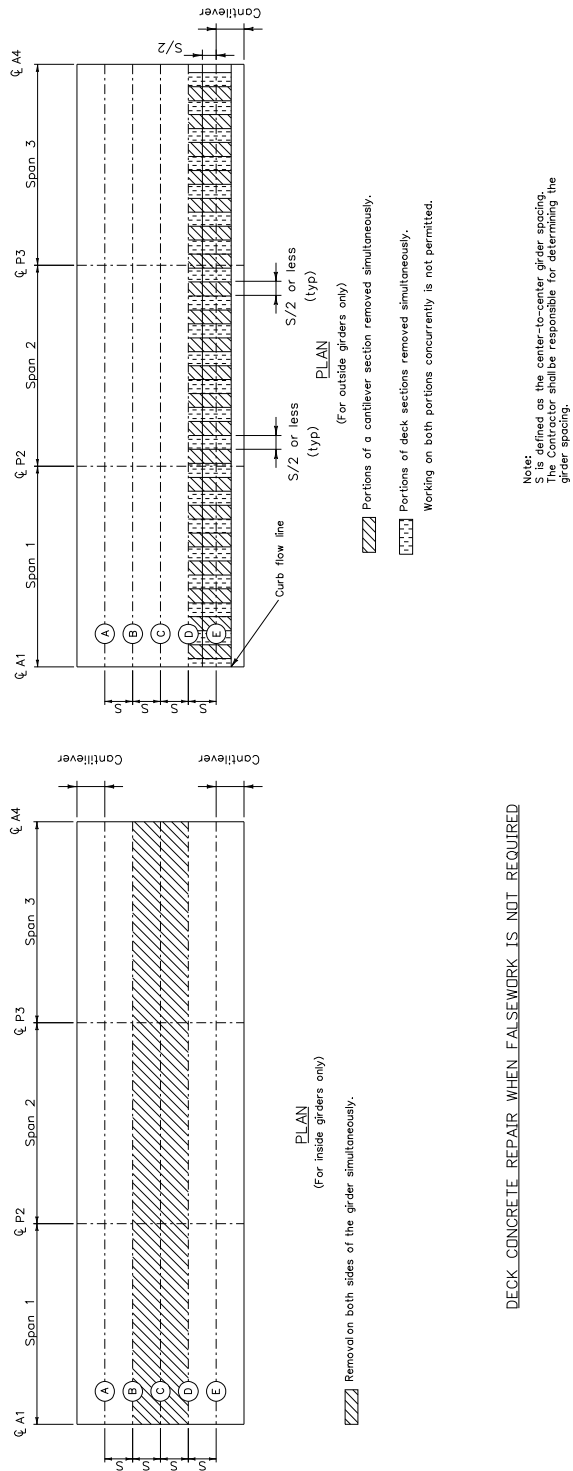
(C)-3 Sample Phasing Details for Girders where Falsework is generally not required
